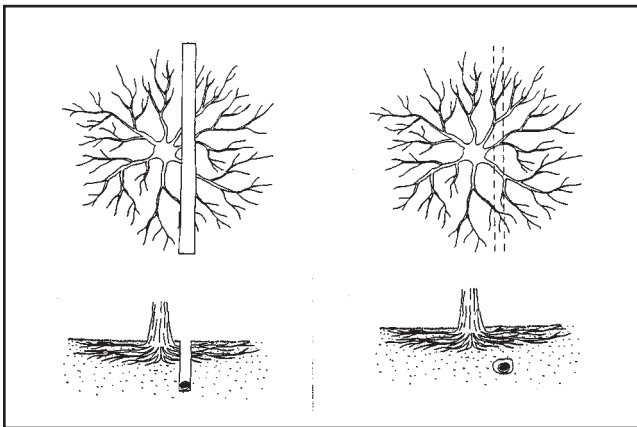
Trenching near a tree can kill almost half its roots. A tunnel in the same place will do virtually no damage to the tree.
